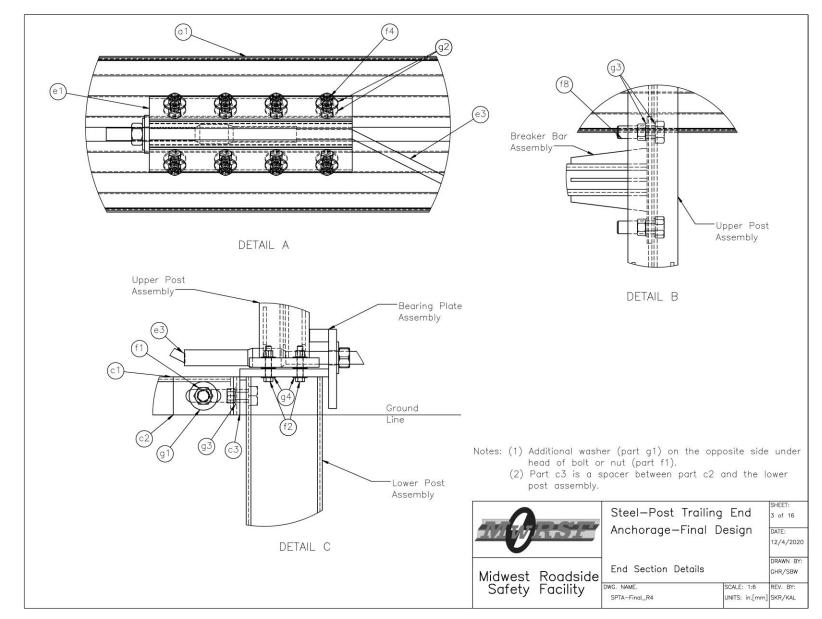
Steel-Post Trailing End Anchorage, End Section Details
